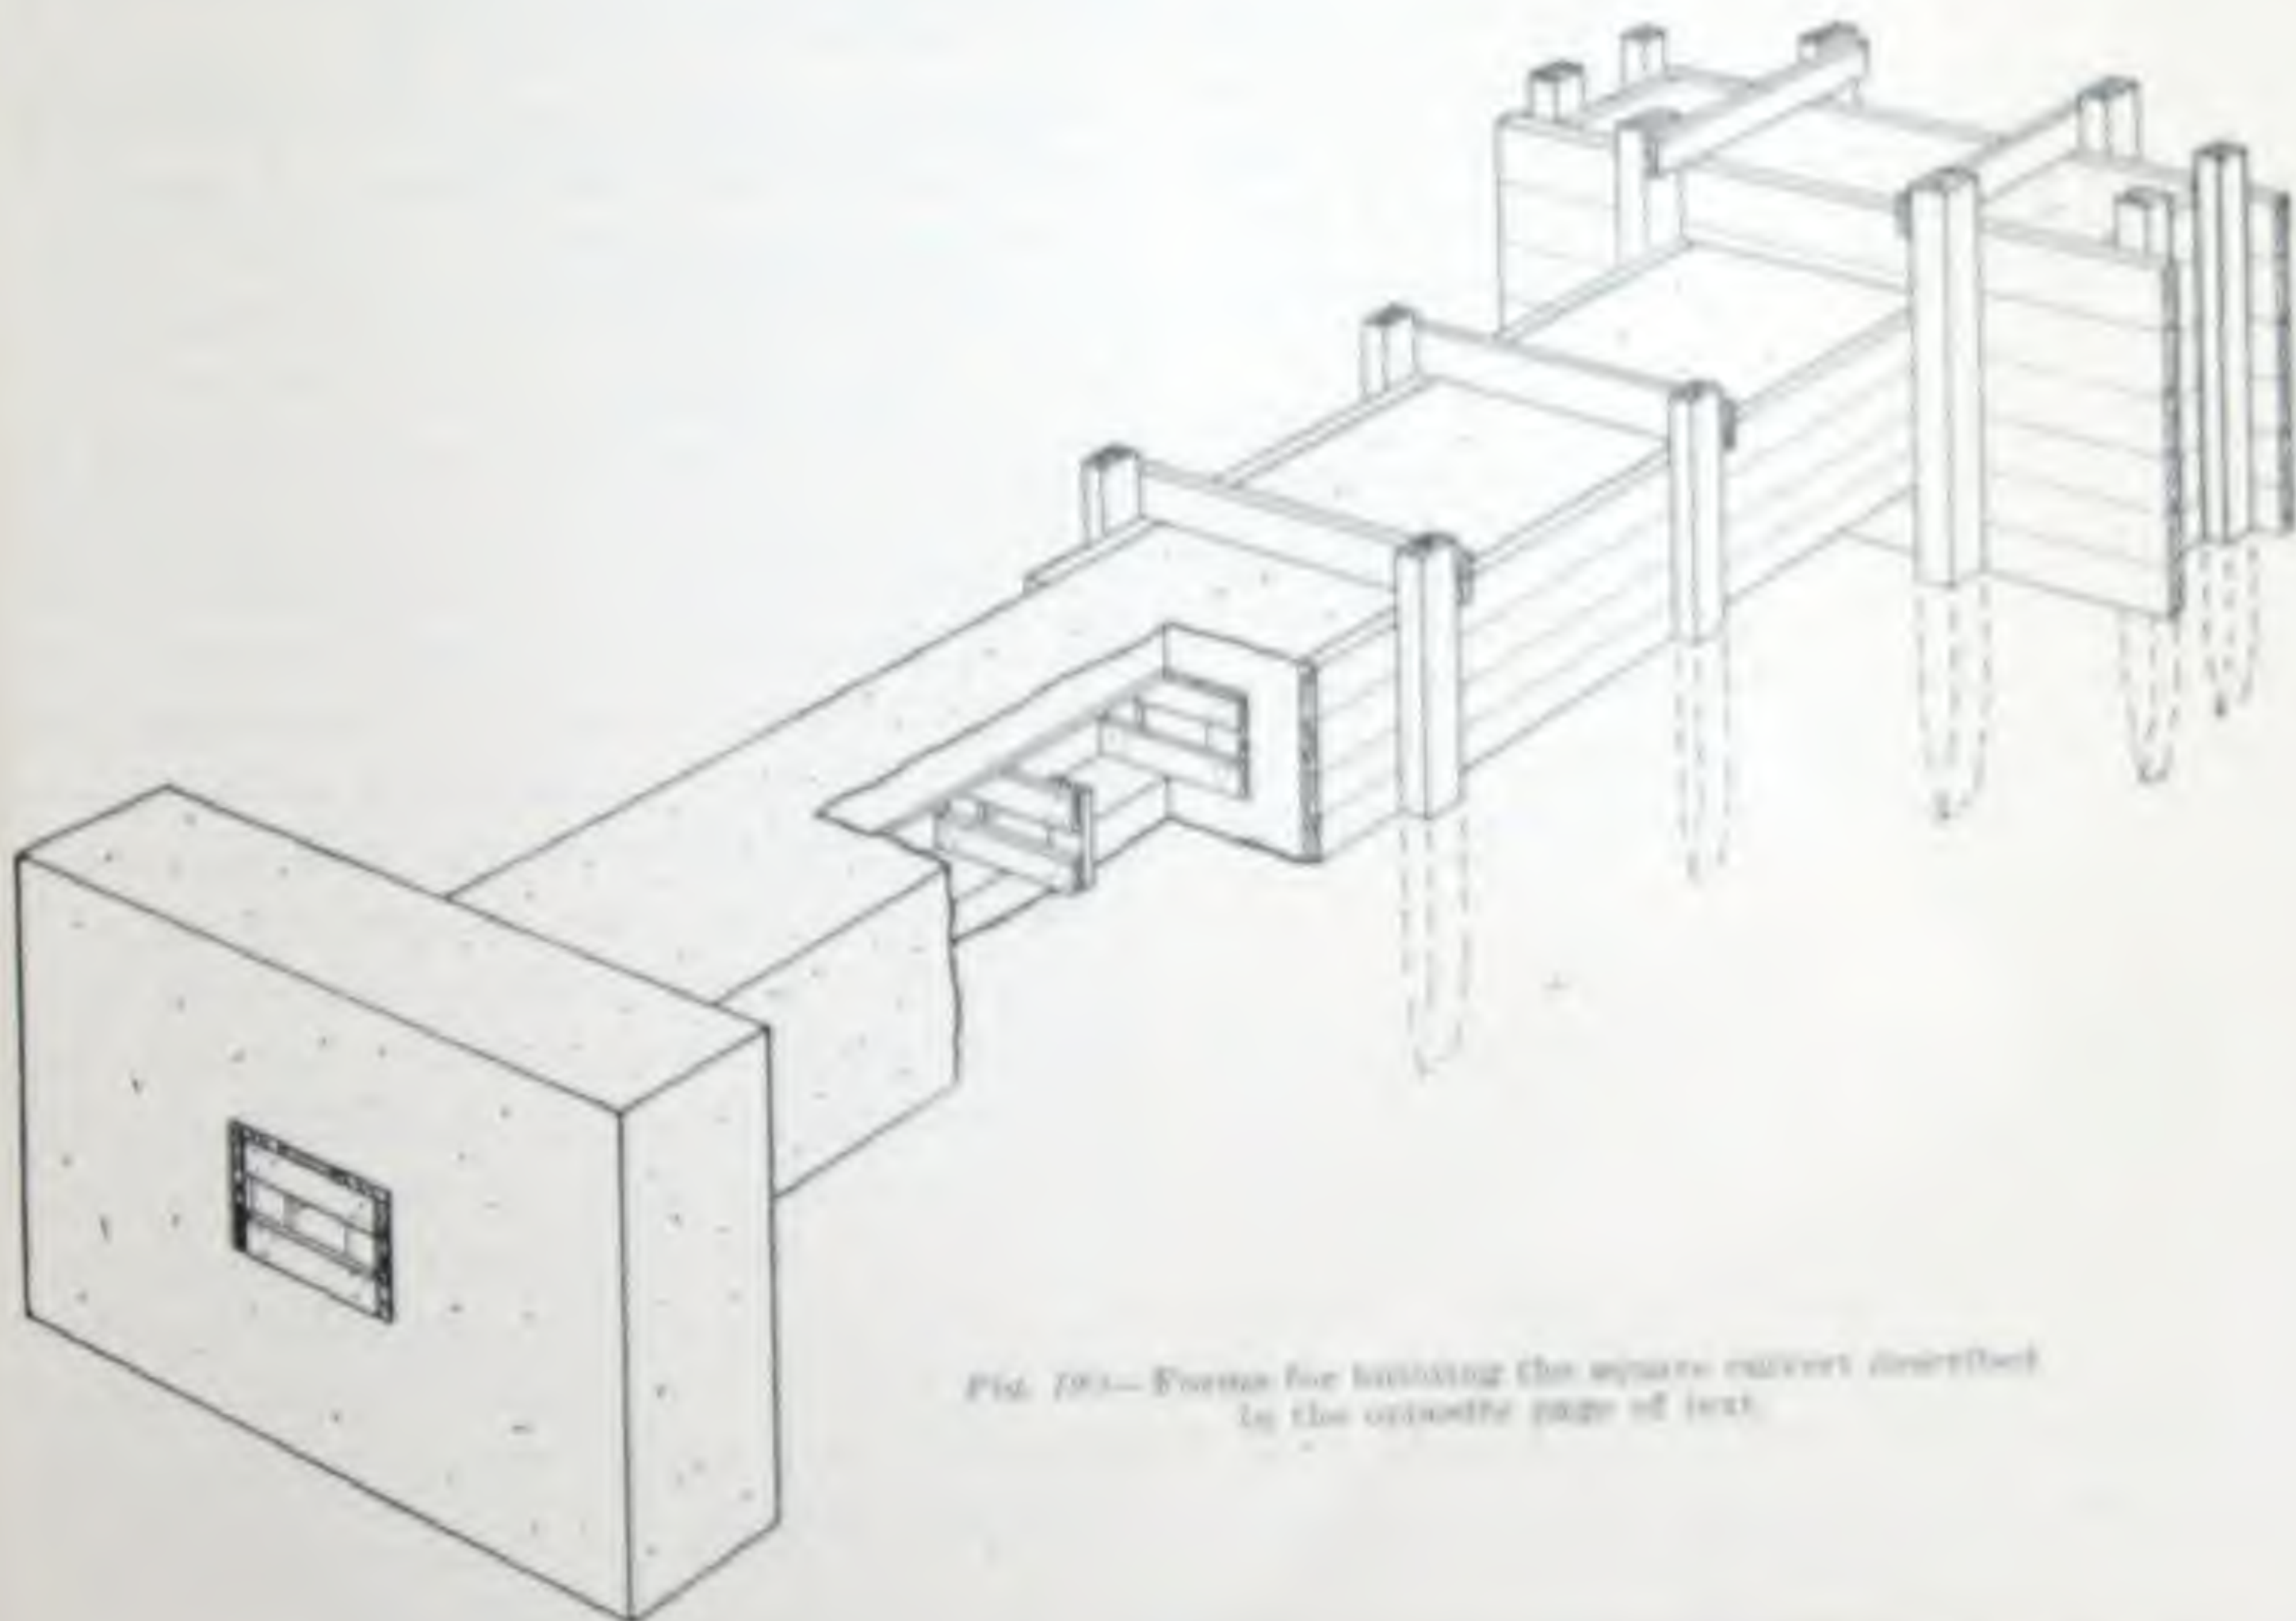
Forms for building the square culvert described in the opposite page of text.
